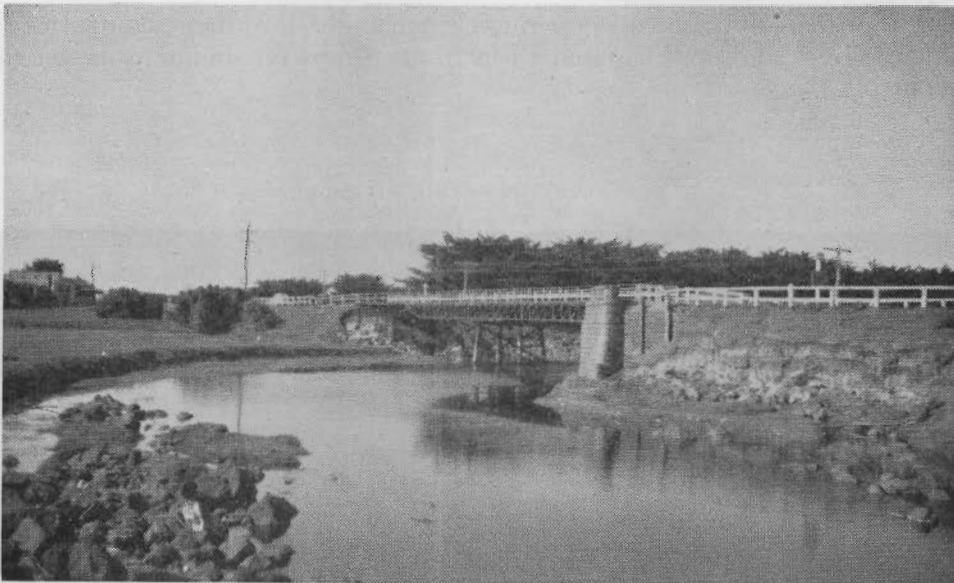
Army type bridge erected over Moyne River at Rosebrook.
